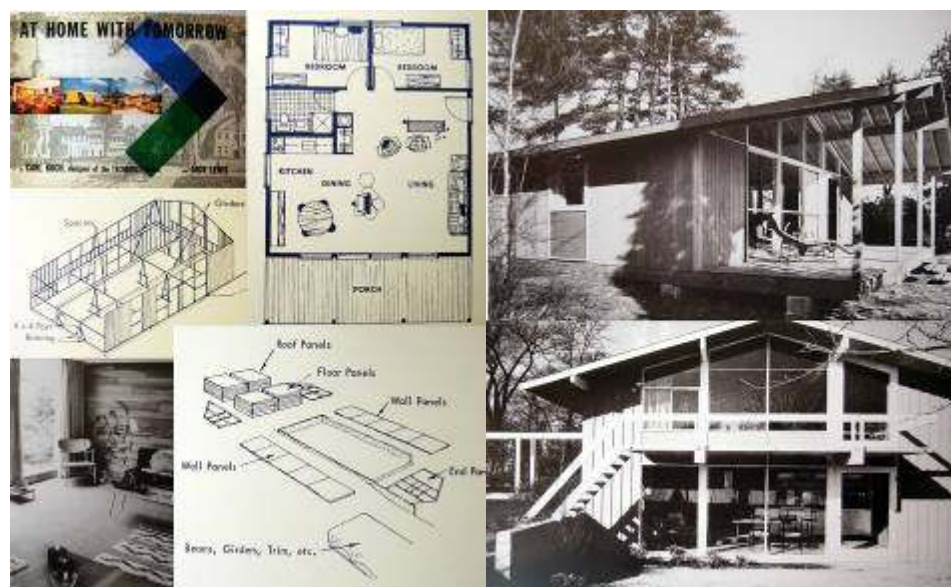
, C. Koch, Techbuild House, Cambridge, Massachusetts, USA, 1954-1967,
